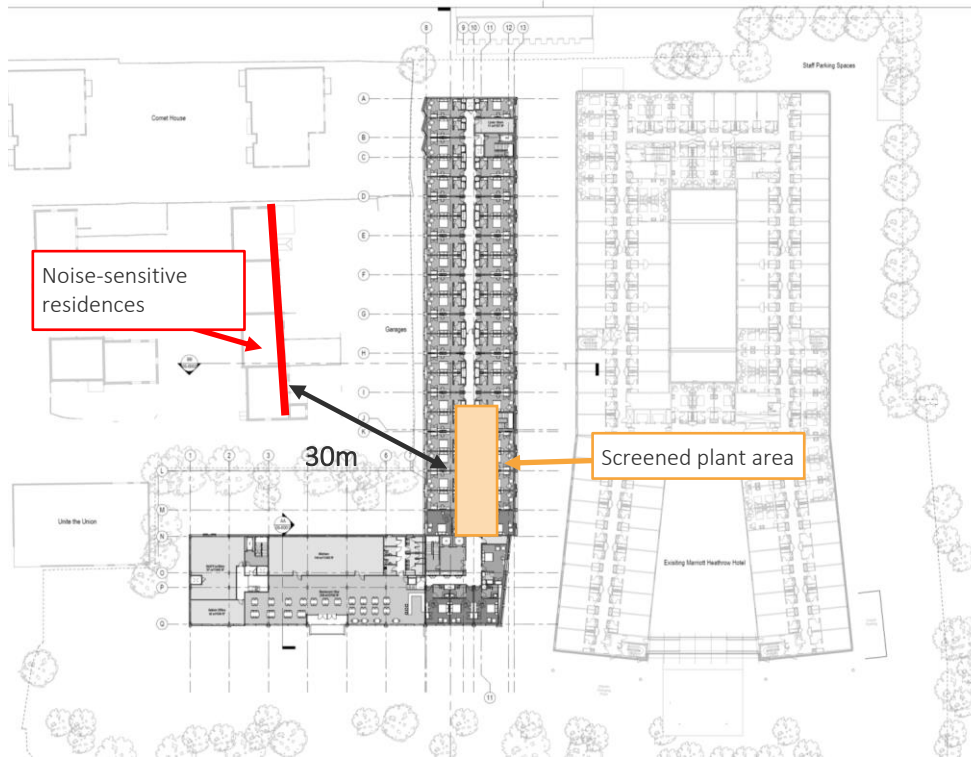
Site plan highlighting plant locations and the nearest noise-sensitive receivers
